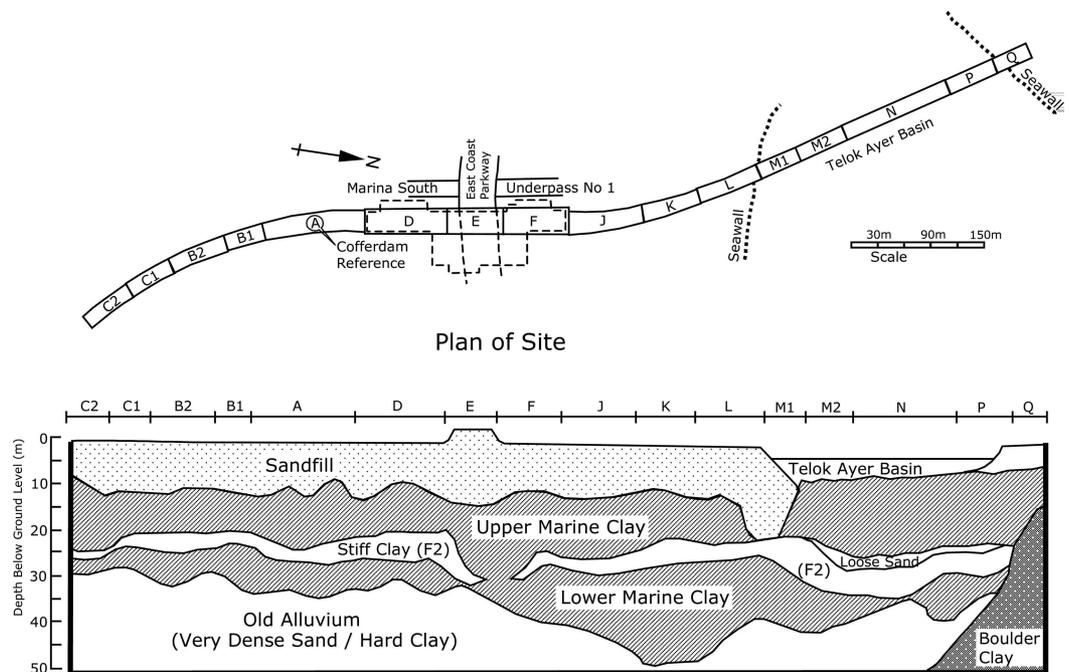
Marina Bay Station and tunnels (after Clarke & Prebharan, 1987).
